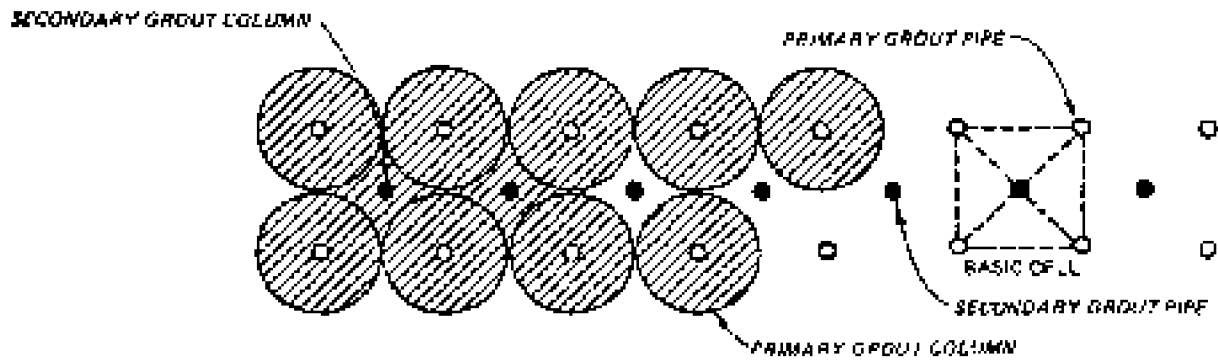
Grout Pipe Layout for Grout Curtain.
